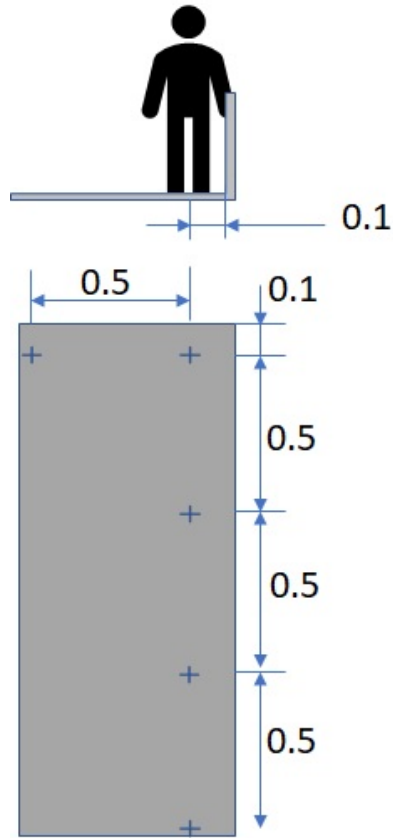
ONE TYPICAL LAYOUT OF A TOWER WORKING PLATFORM OF MOBILE TYPE
